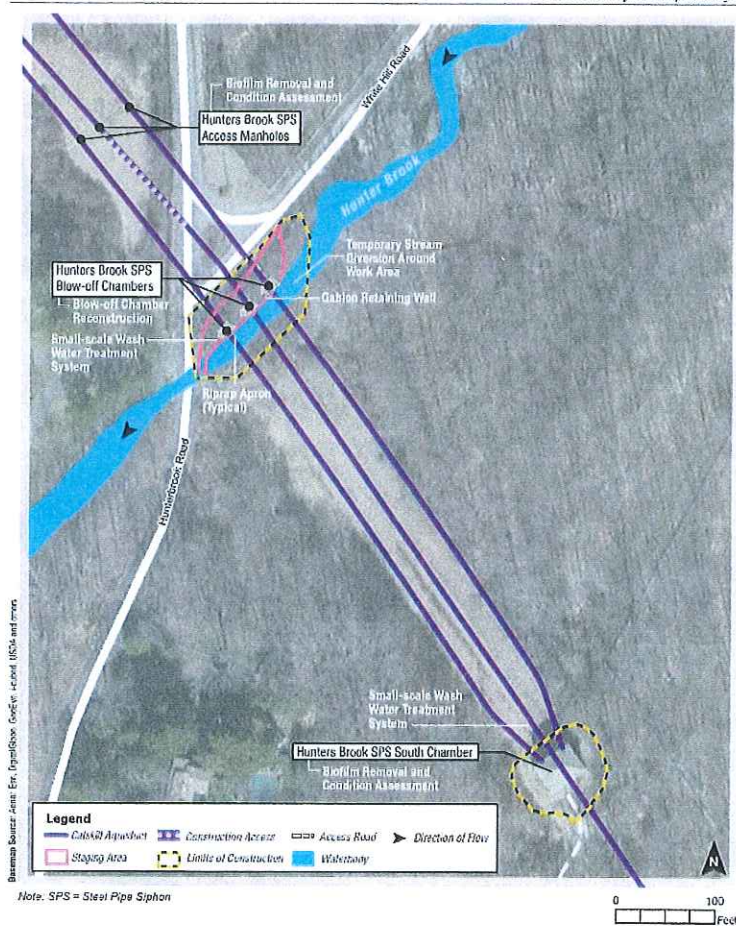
Site Plan for Hunters Brook SPS Blow-off Chambers and Hunter Brook SPS South Chamber – Jacob Road Study Area
